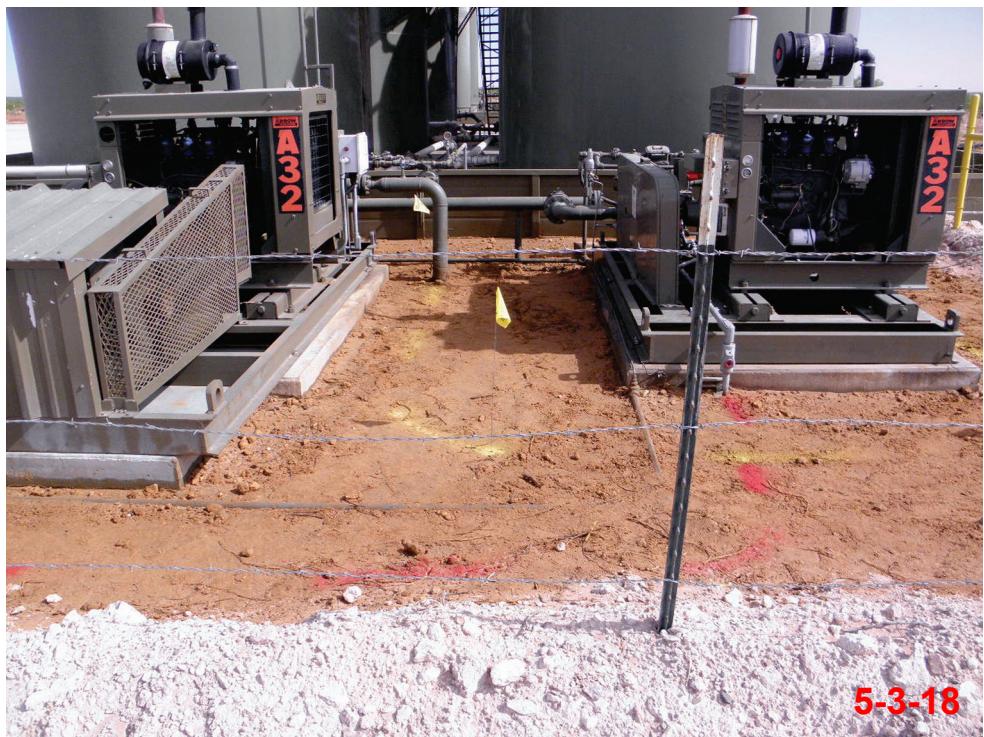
View of impacted soil around LACT Unit equipment facing north
